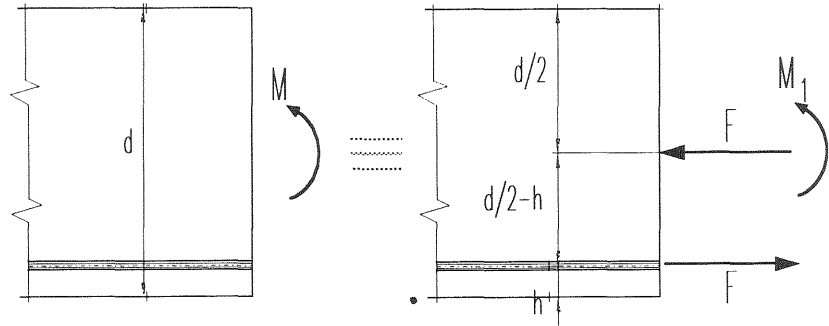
Distribution of moments in cracked cross section of a reinforced concrete beam
